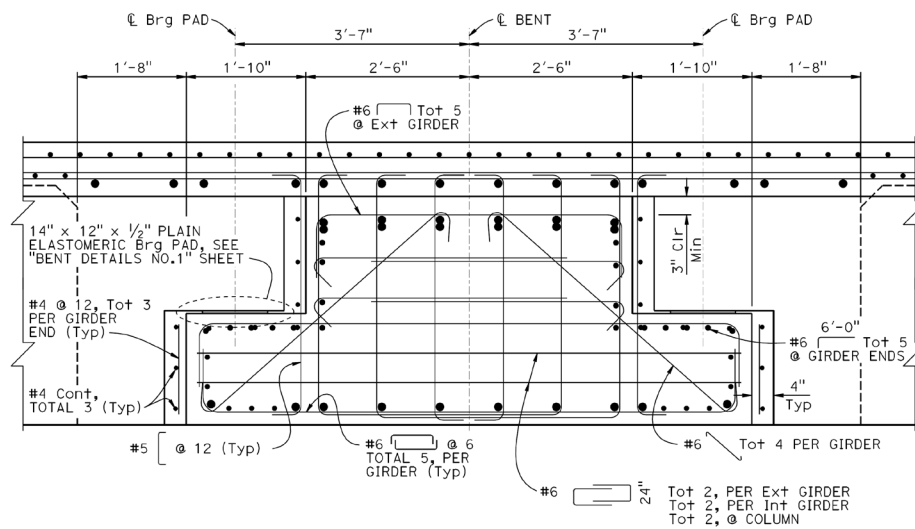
Existing Inverted-Tee to Dapped End Girder Connection Example Detail
